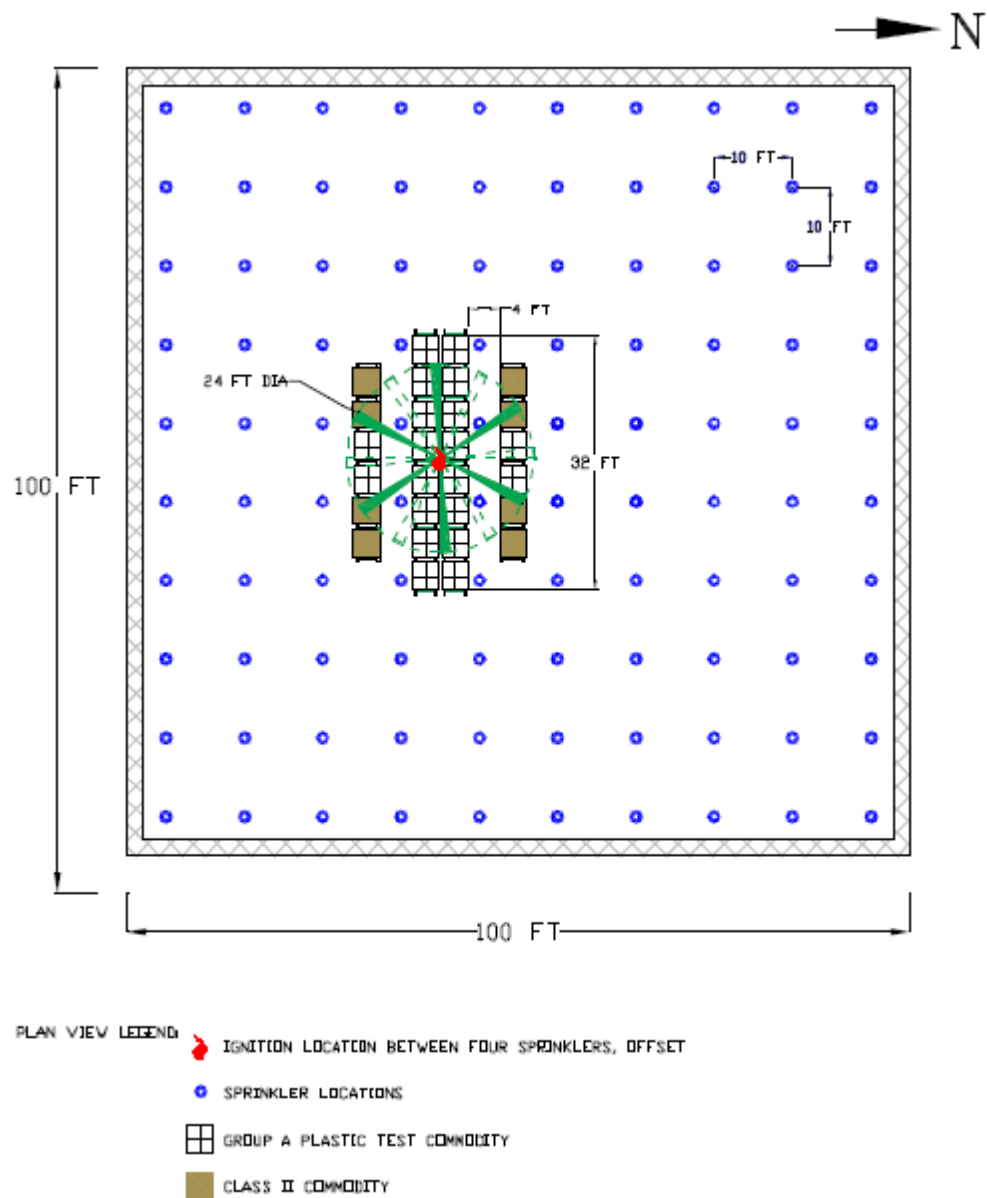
Schematic of the plan view of the storage racks, fuel packages, ceiling fan and ignition location for the high-rack storage section tests, for test arrangement 1 (SEC, 2009)
